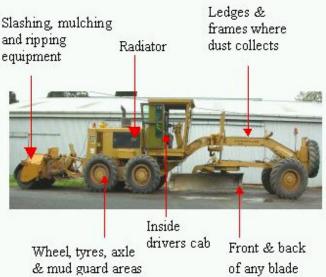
Key areas to inspect machinery for evidence of weed seeds or soil
